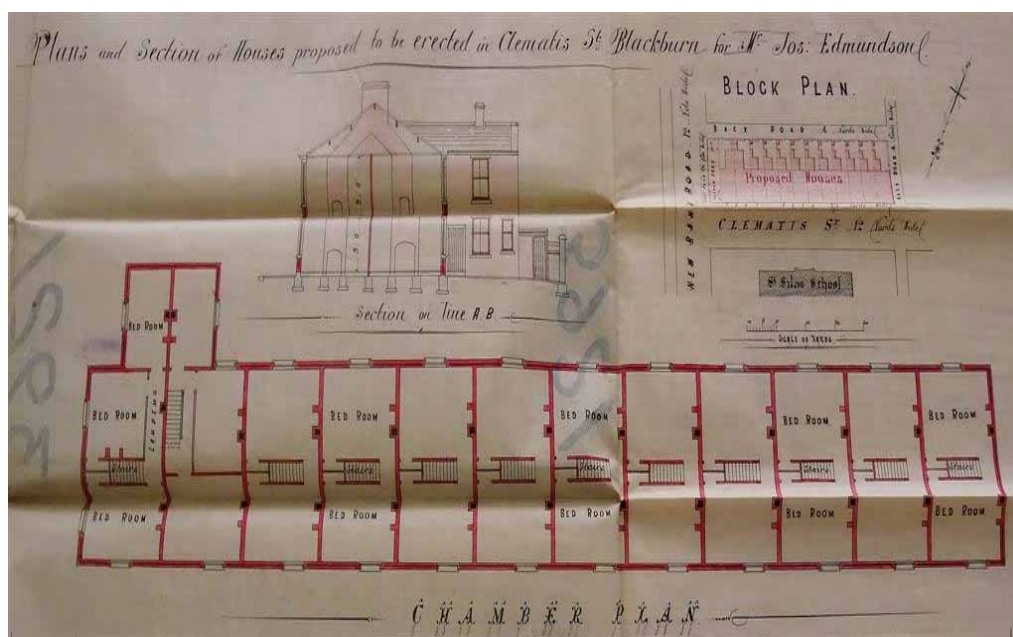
Plan of chambers of houses to be constructed on Clematis Road (LRO CBBN/3/3 Plan No 3921)
